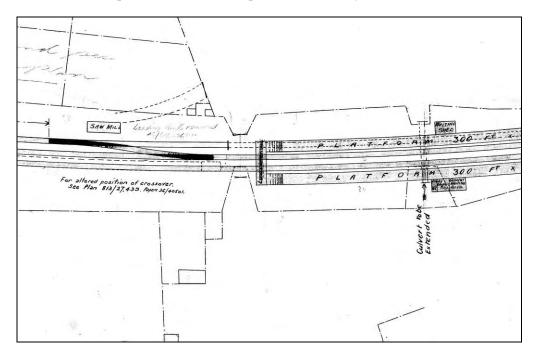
Undated plan of Maldon Railway Station showing location of Sawmill (Source: RailCorp Plan Room).
